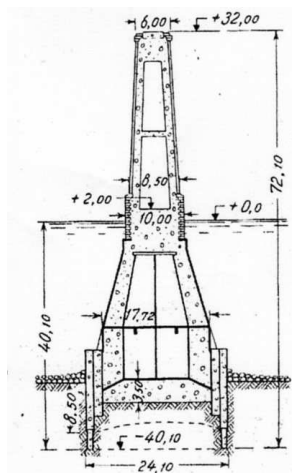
Cross-section of pier 3 [1]. The caisson in the bottom of the pier is surrounded by a wall of pipes
